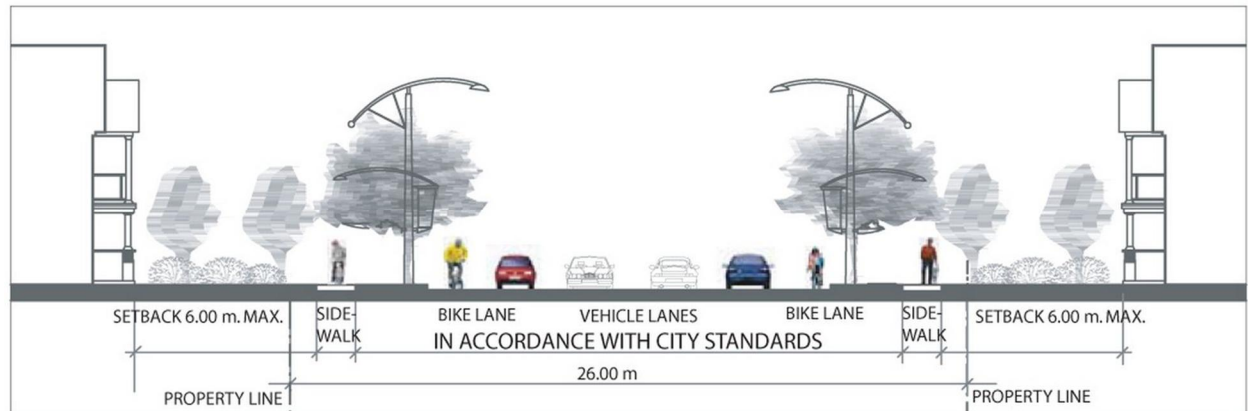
Riverside South CDP Cross-Section for 26m Road Allowances
